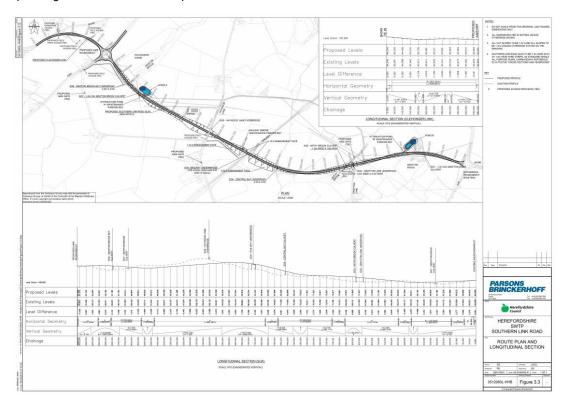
Current Route Plan and Longitudinal Section Drawing
